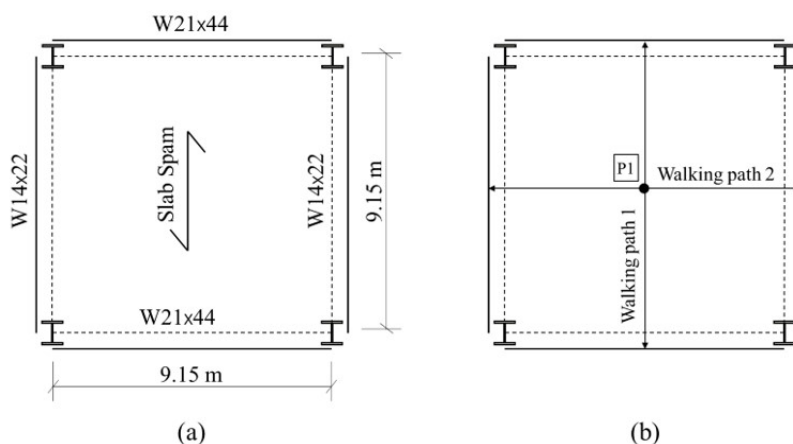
Structural plan of the first floor (a) and walking test information (b).
